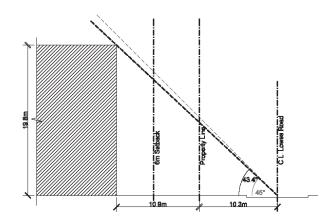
Building's angular plane from Lowes Road (measured from road centreline)
